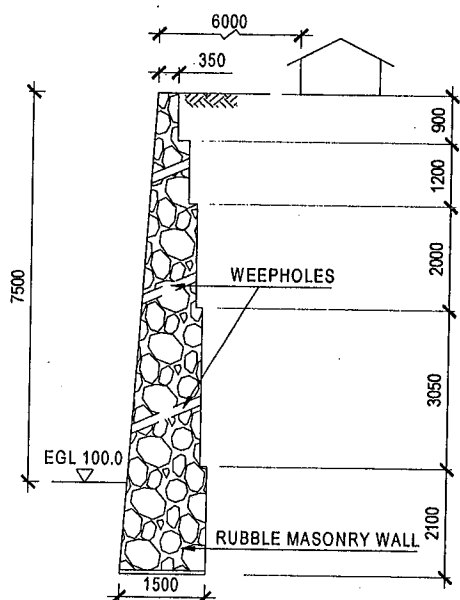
Sectional elevation of existing retaining wall at highest embankment elevation.
